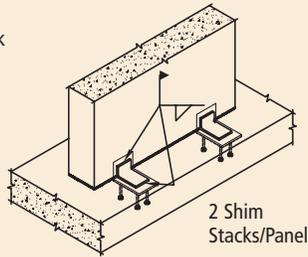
Bearing wall to foundation (BWF1).
